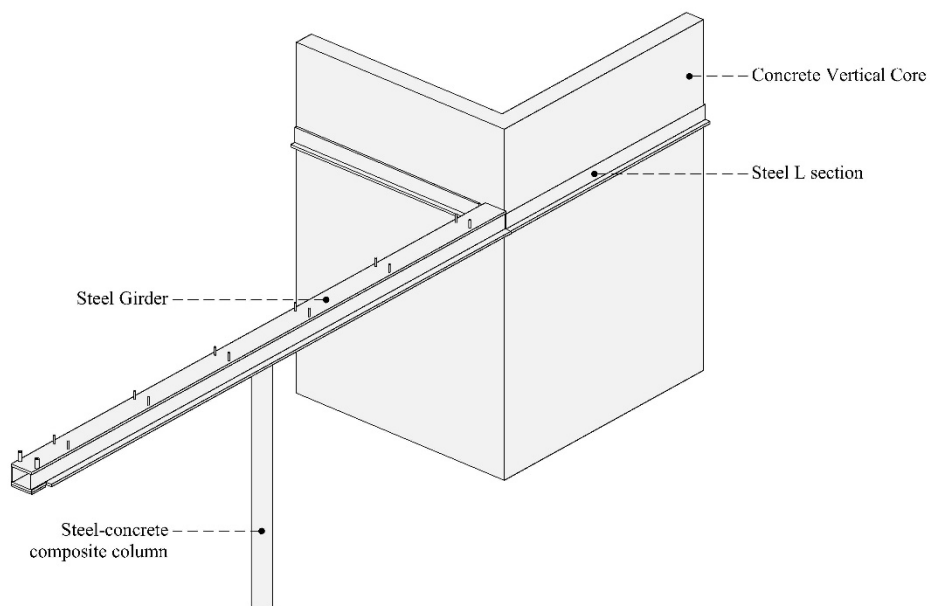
Steel girders, steel L sections and steel-concrete columns of CREE system (Modified from CREE Buildings)
